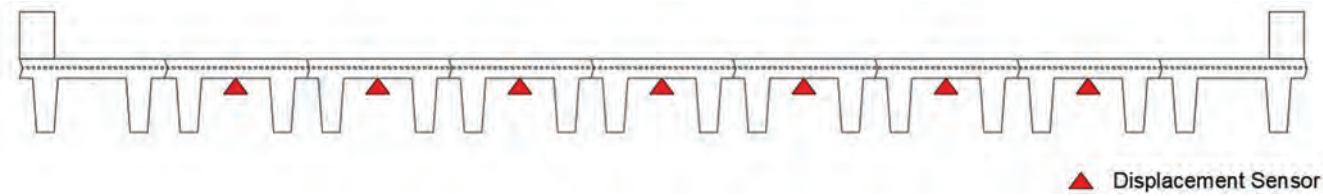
Instrumentation Layout for Wide-leg Channel Bridge “K” Factor Testing (Typ.)
